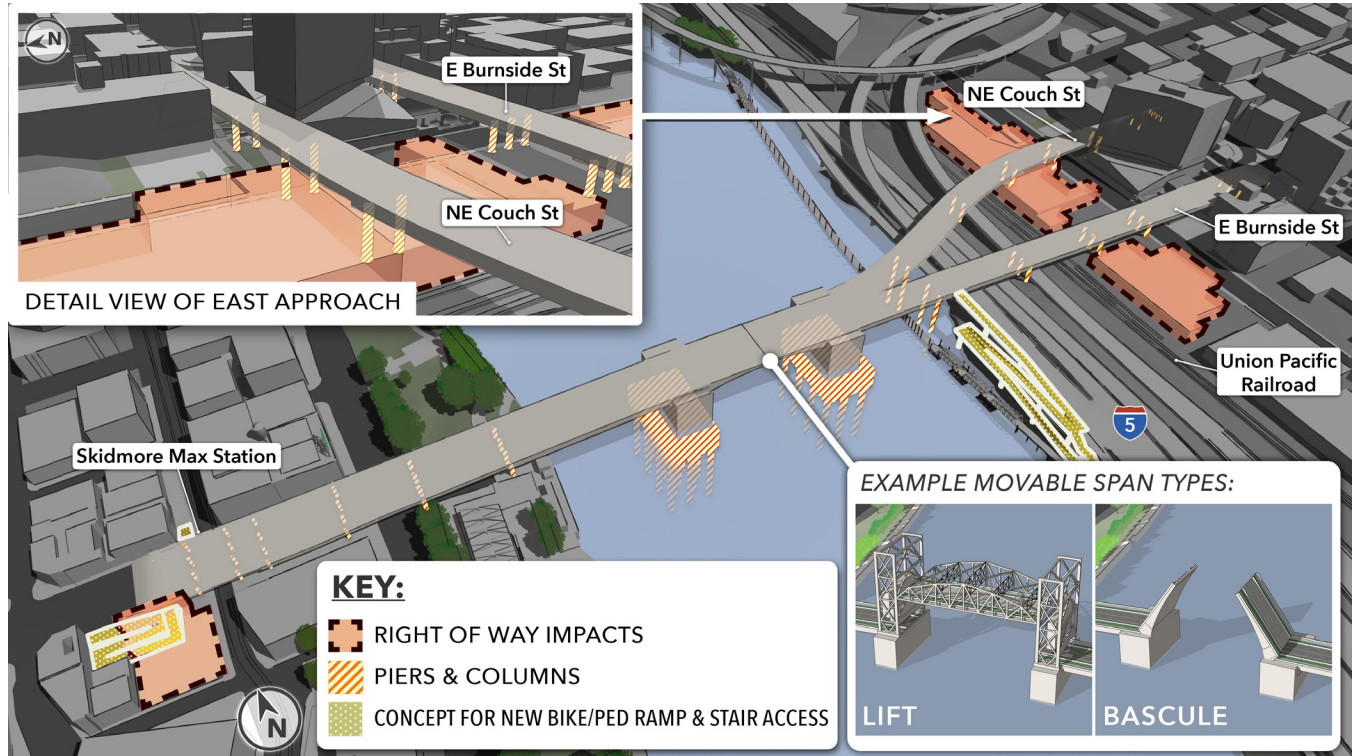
shows an aerial view of the proposed layout with the proposed locations of bents and bridge span sections, as well both the bascule and vertical lift options. See Table 2.2-1 for more information on major bridge elements. Additional visualizations of the Couch Extension Alternative can be seen in Figures 3.12-4 through Figure 3.12-6 and in Attachment G.
